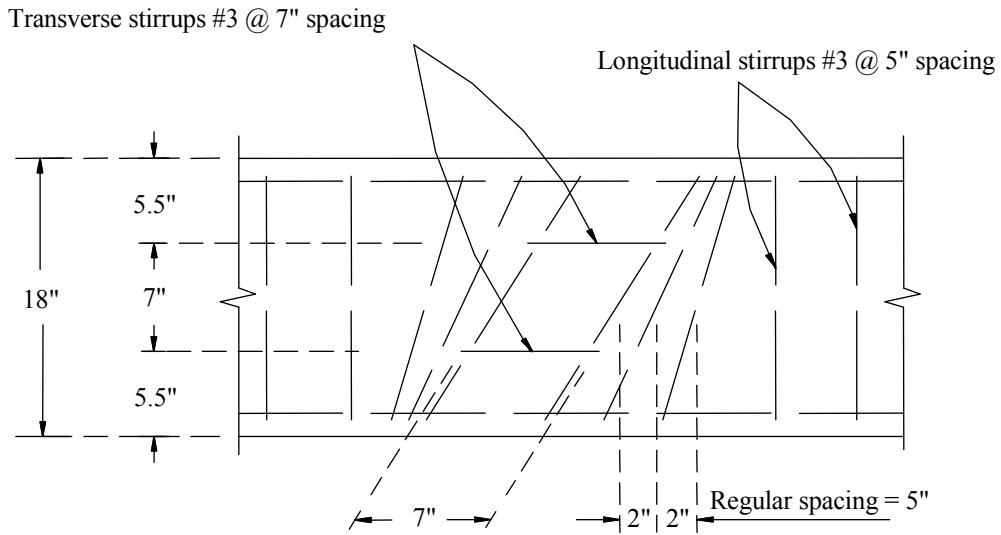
Reinforcement of interior box-beams at the intermediate diaphragm.
